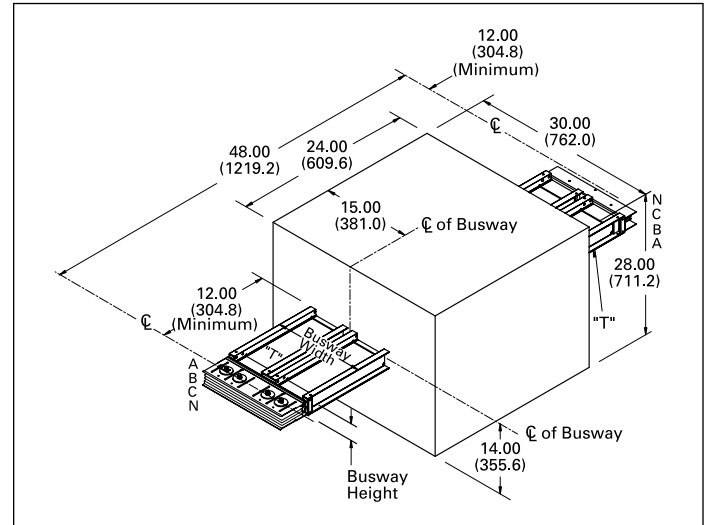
180° Transposition—Dimensions in Inches (mm)
